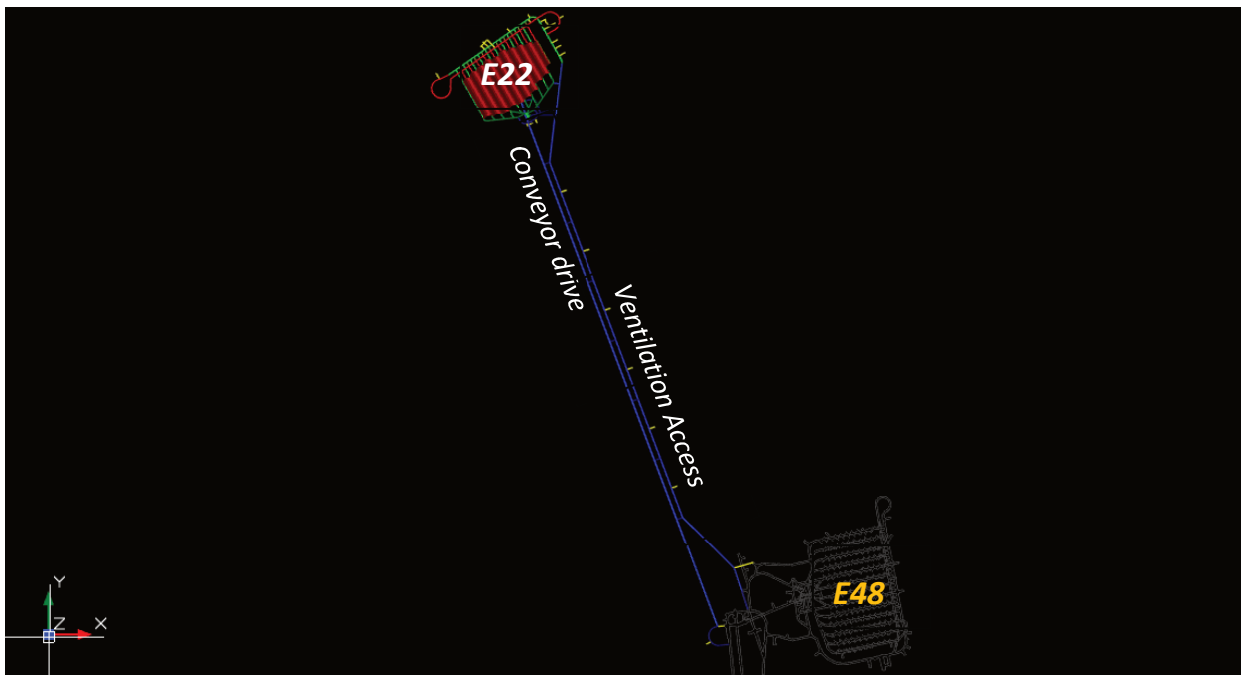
Plan view of previous E22 study showing twin drives for ventilation and material handling system
